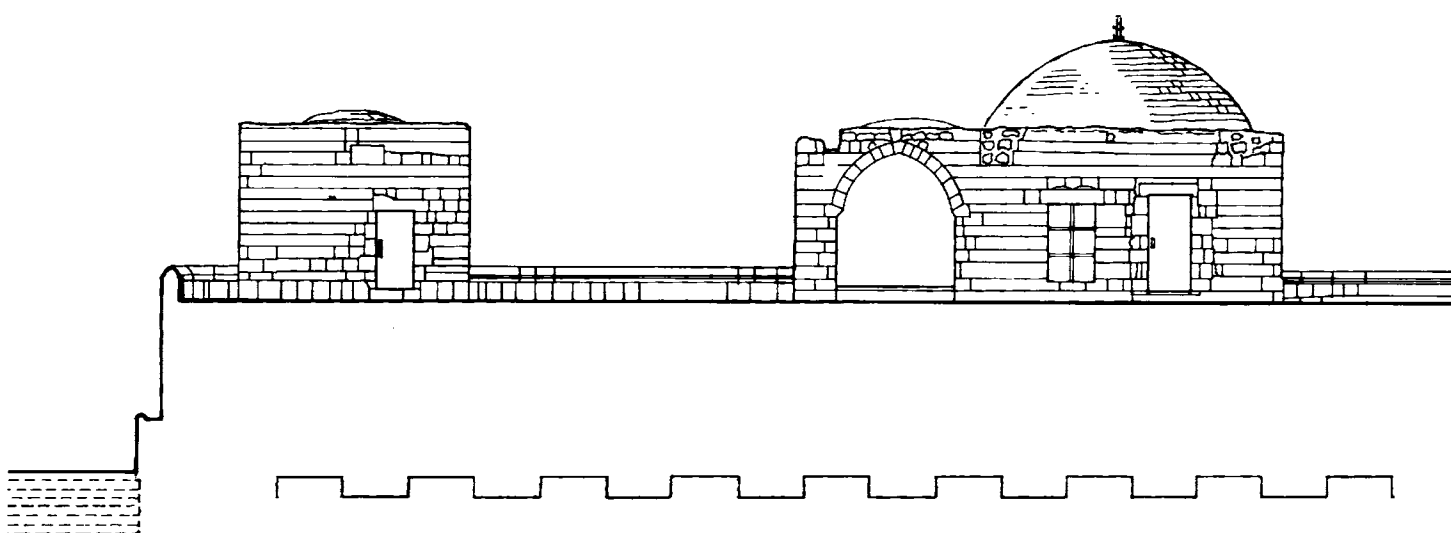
Khalwat Bairam Pasha, main, eastern façade elevation.
